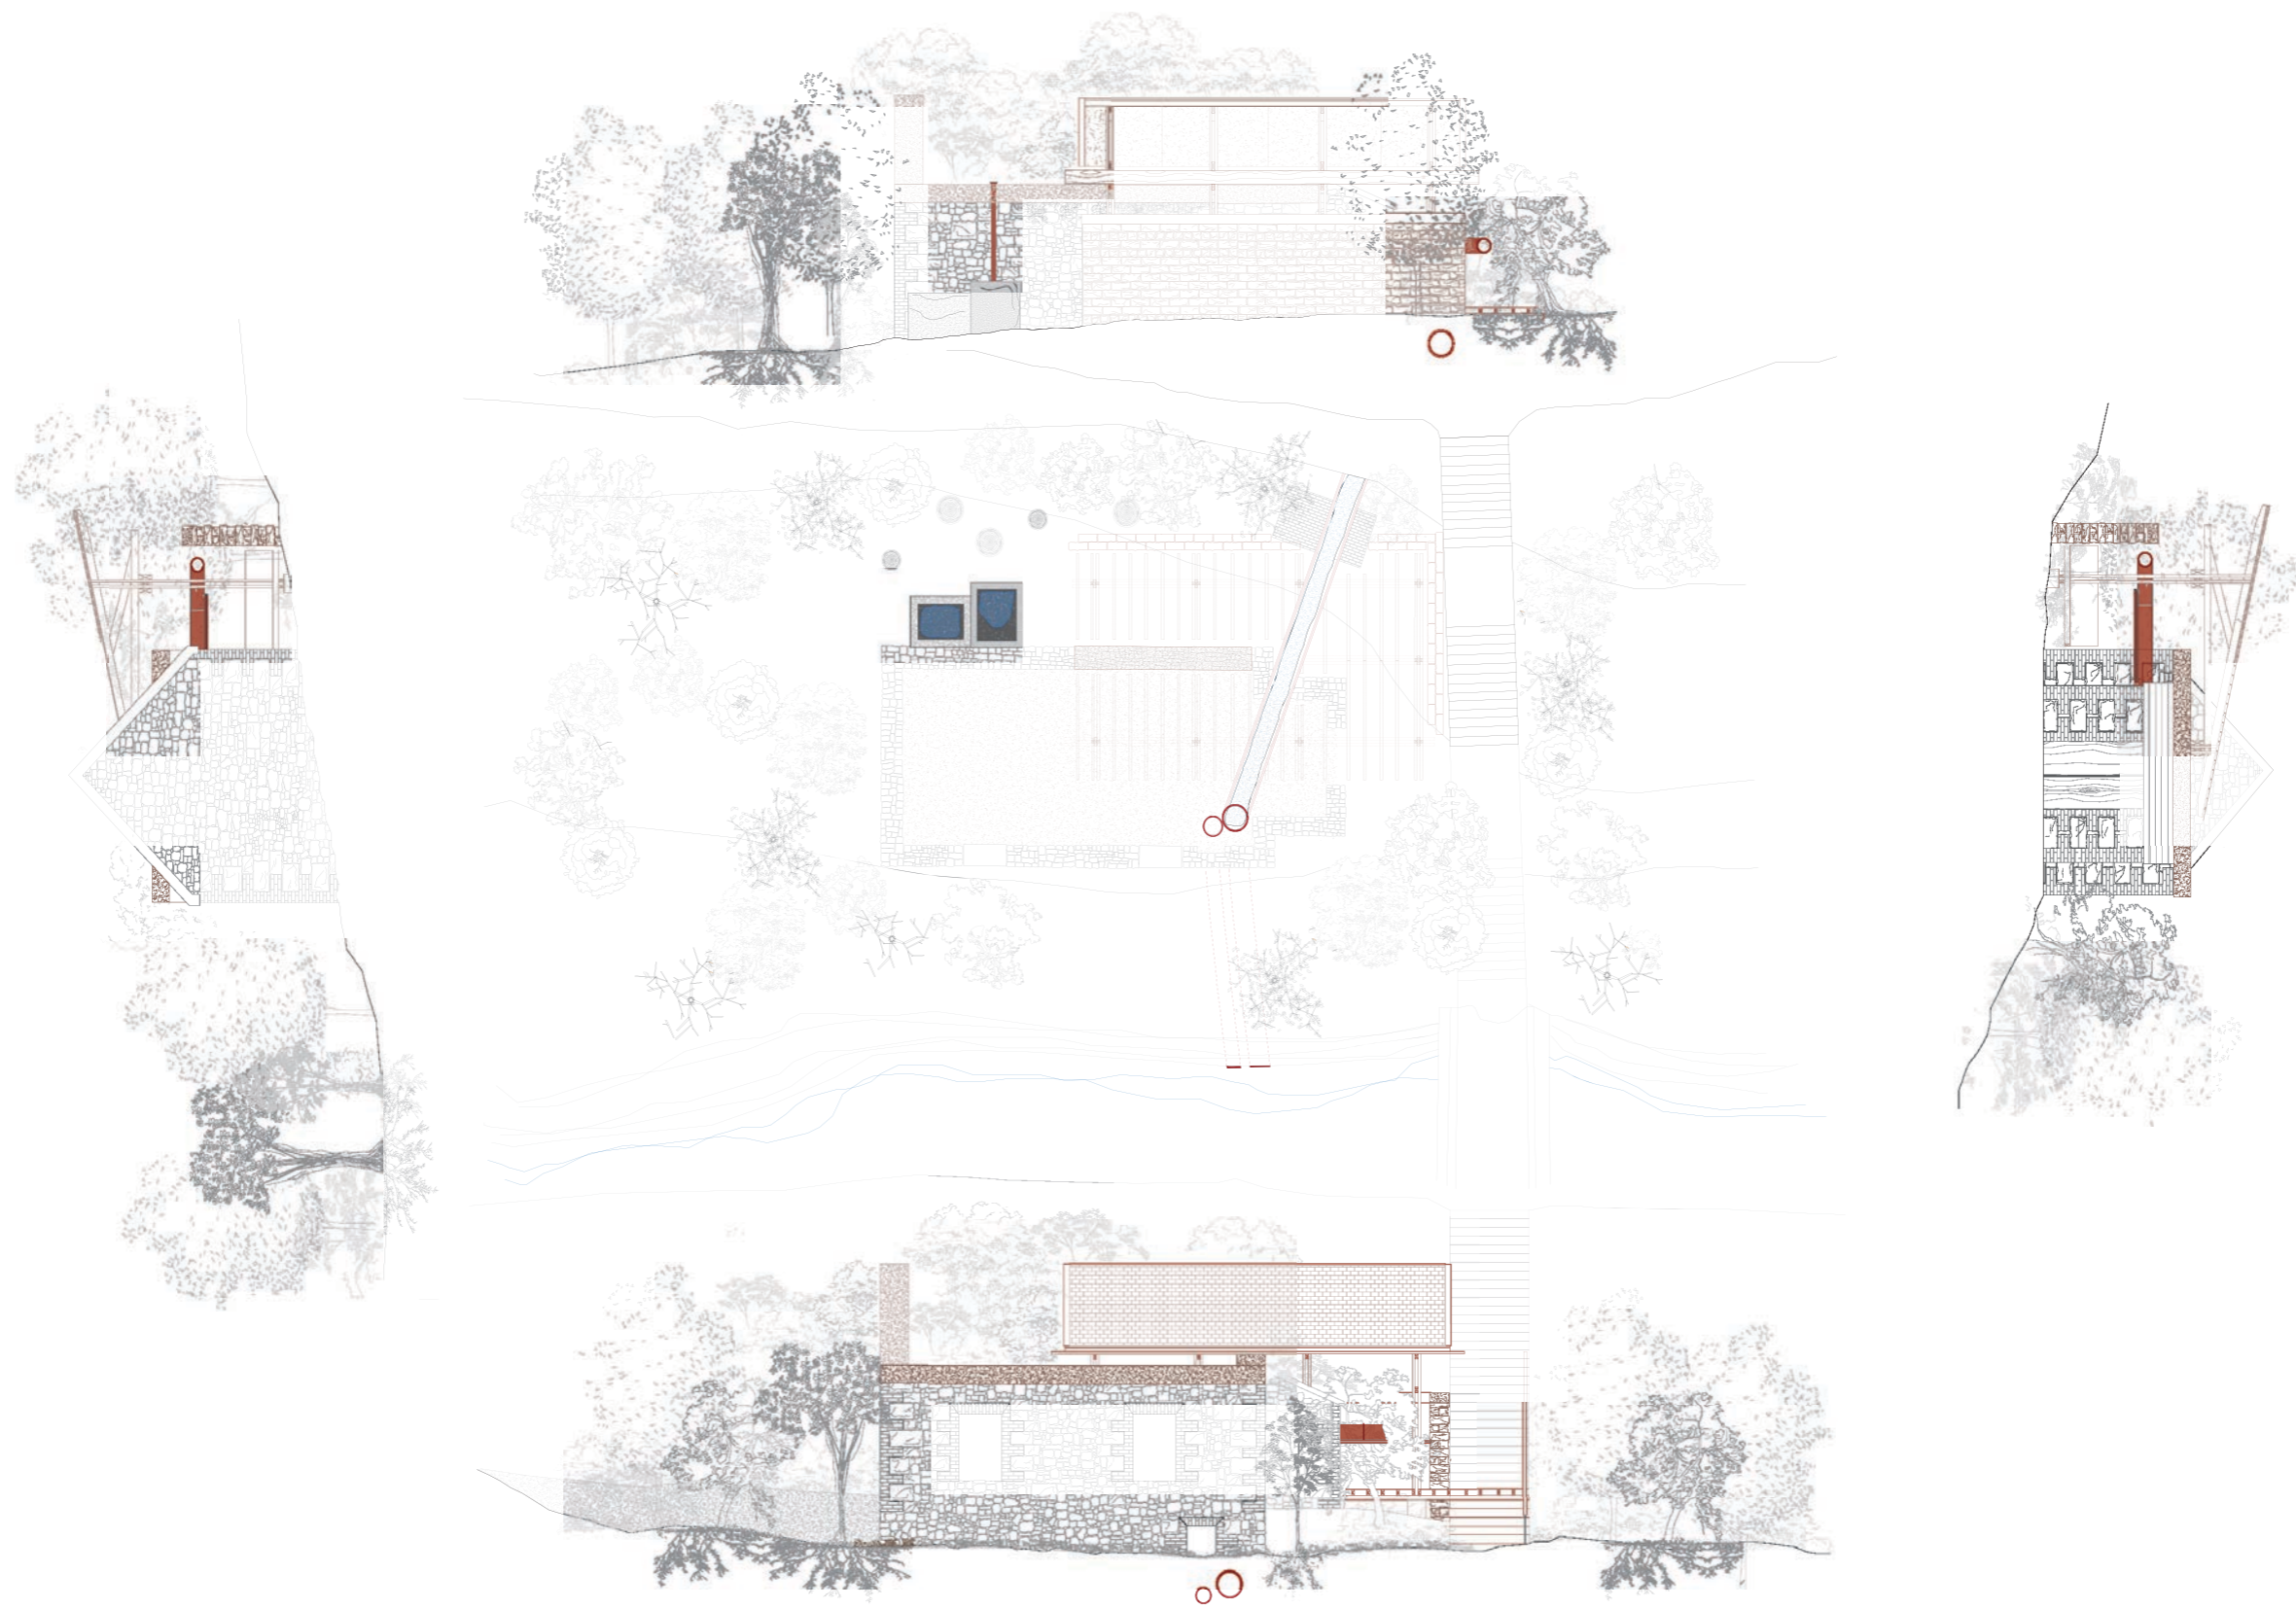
, Author, "Unfolded New Timber Structure to Shelter People and Biodiversity", Drawing, 2022
